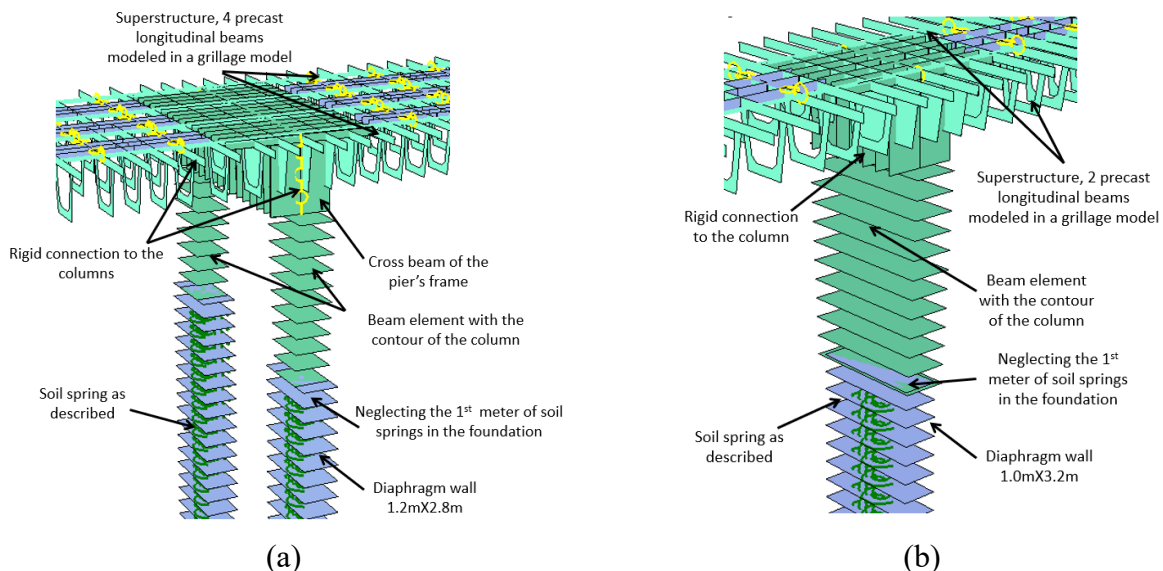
Pinahs Rosen bridge FEM of the piers (a) Piers no. 2 frame; (b) Pier no. 12 column
